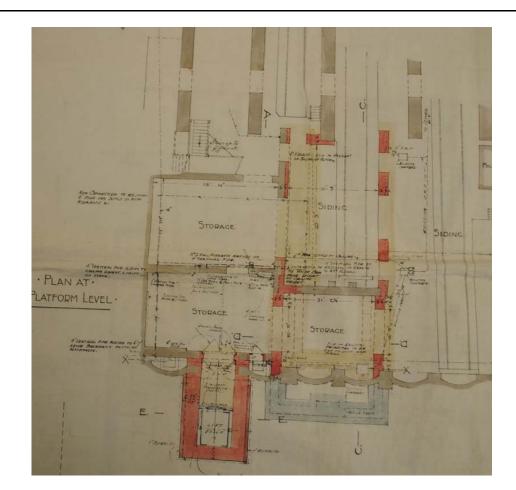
Basement plan of 3 Lindsey Street showing direct access to the GWR offices to the right (Source – LMA, GLC/AR/BR/22/BA/043620)
